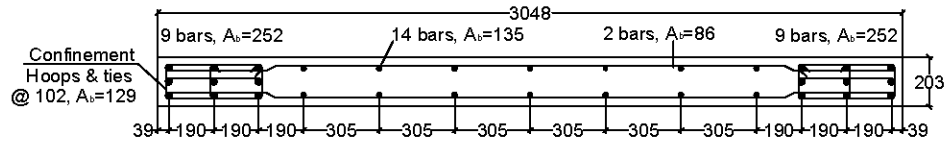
Typical planar wall characteristics: unit, mm; A_b , cross-section area of one steel bar.
